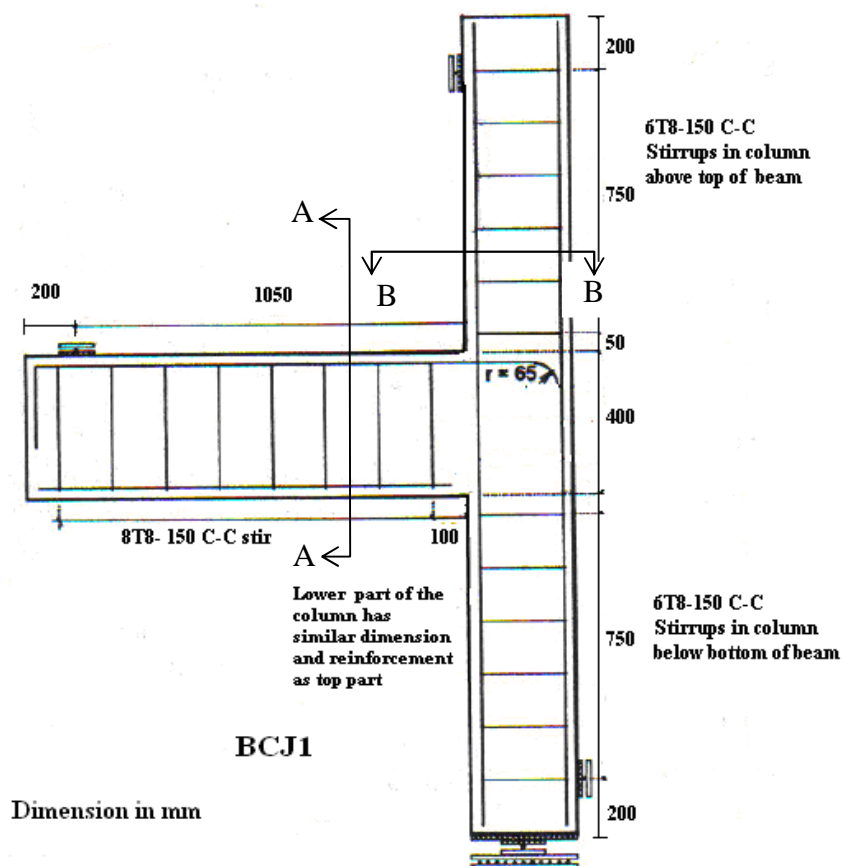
Reinforcement detailing of experimentally tested BCJ-1.
